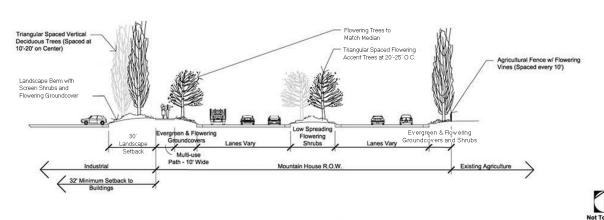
COMMUNITY EAST EDGE AT MOUNTAIN HOUSE PARKWAY (MAIN STREET TO BYRON ROAD)
